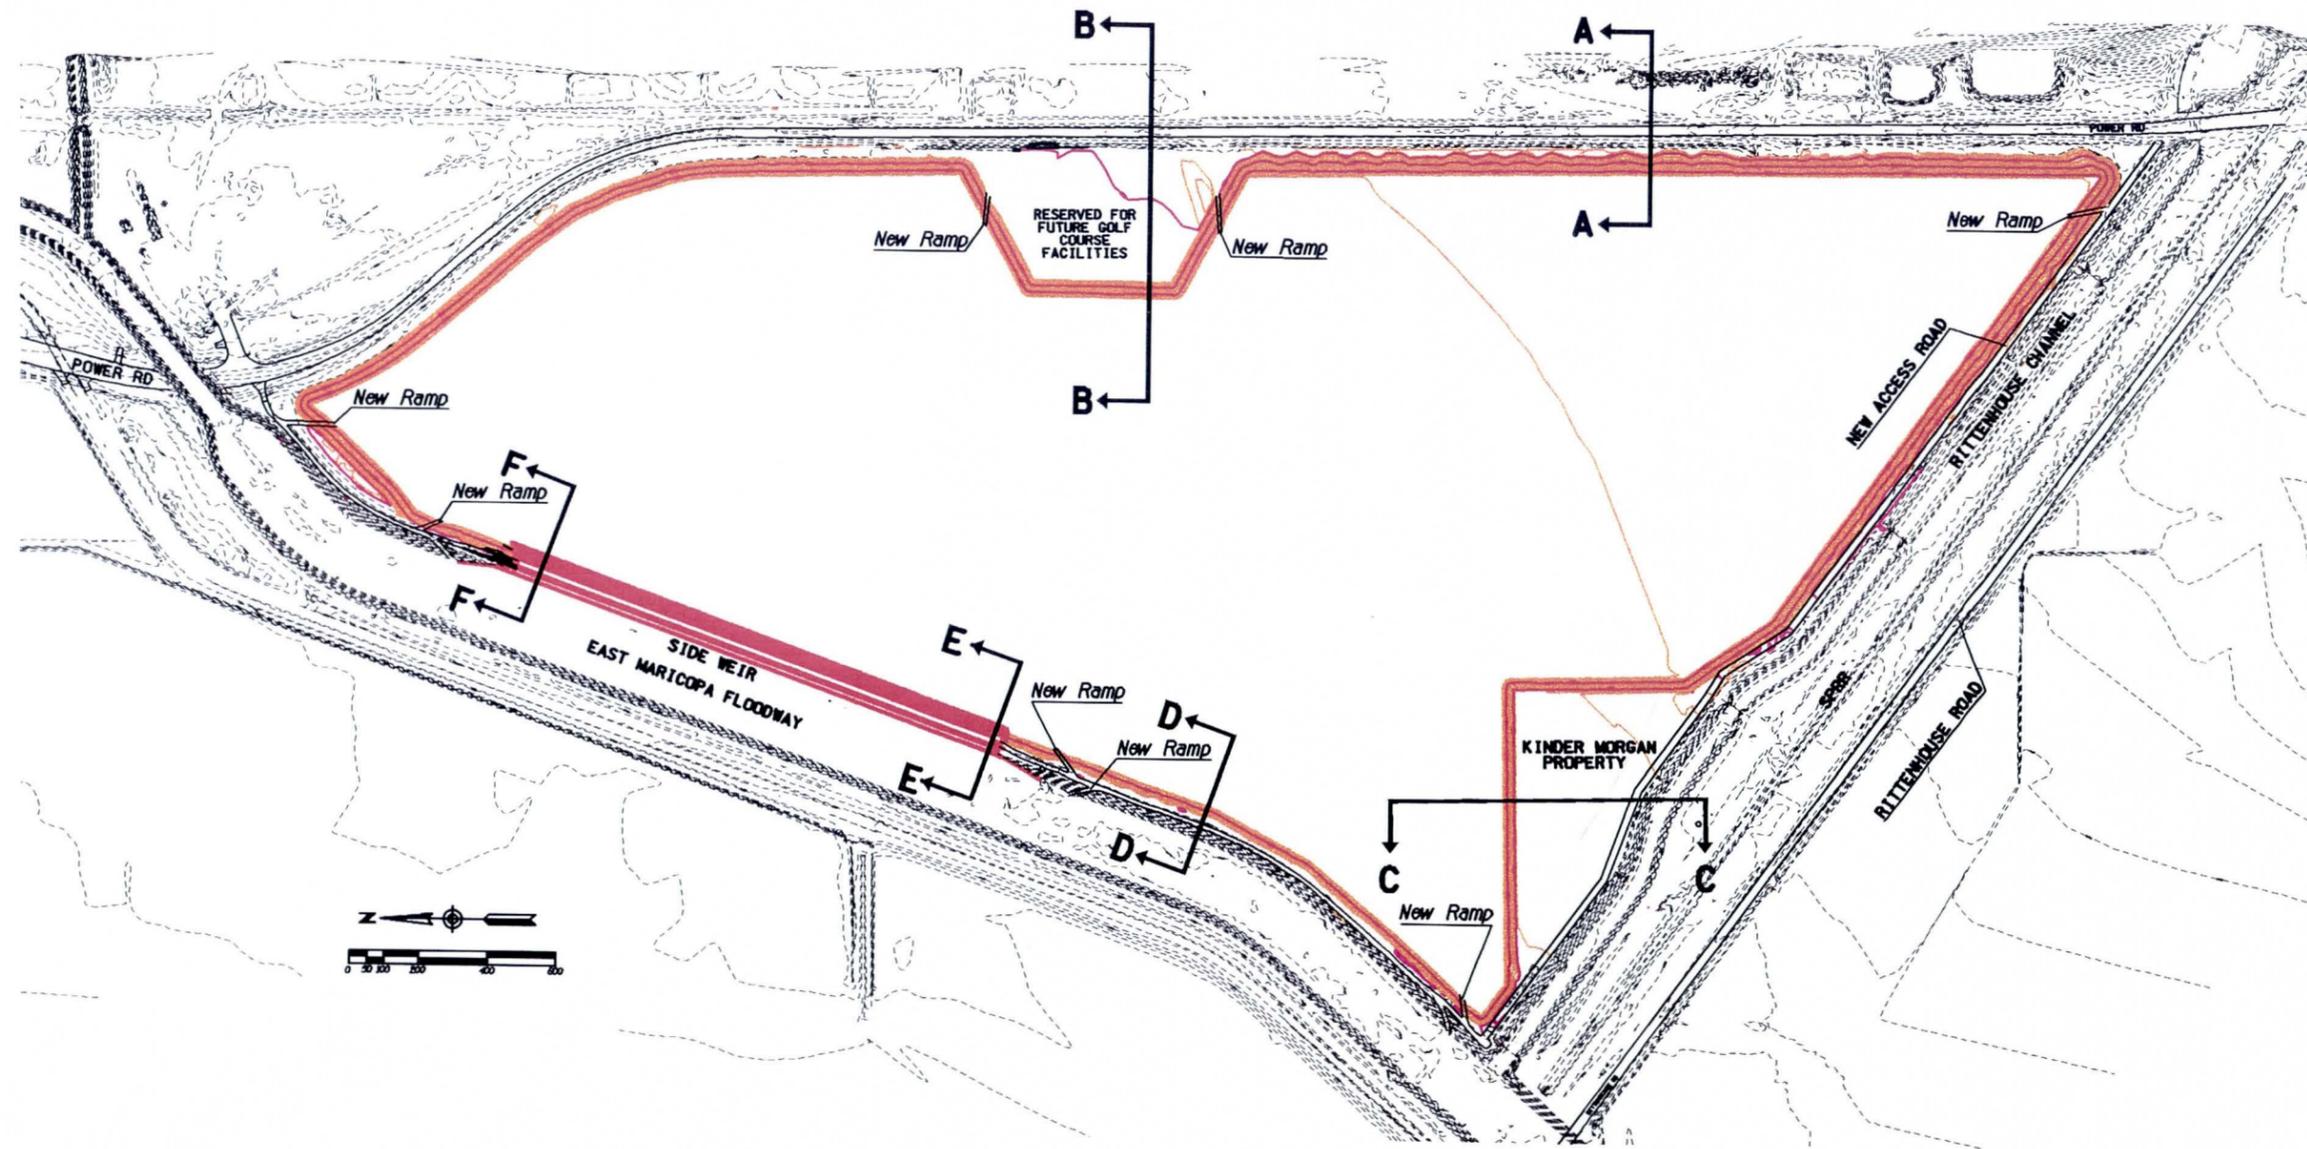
This sketch shows the planned improvements to create the Rittenhouse Basin. The typical sections shown cut in this sketch are shown in more detail in Figures 26 through 30.
